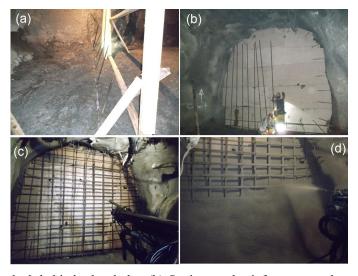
(a) Wood plank behind rebar bolts; (b) Setting steel reinforcement rebars; (c) Barricade is ready for shotcrete; and (d) Shotcrete application of barricade
